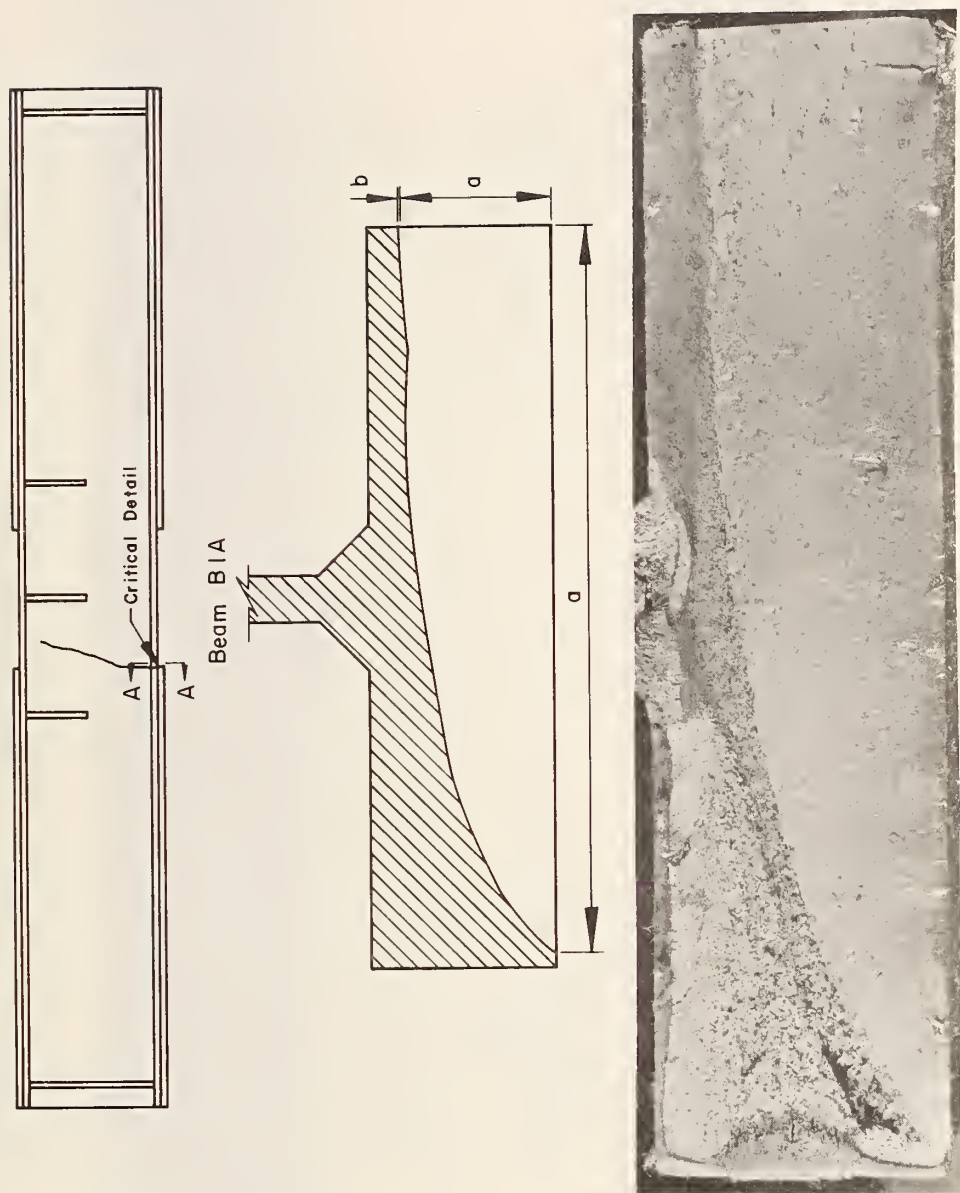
Fatigue and Fracture Surface, B1A (A514)
